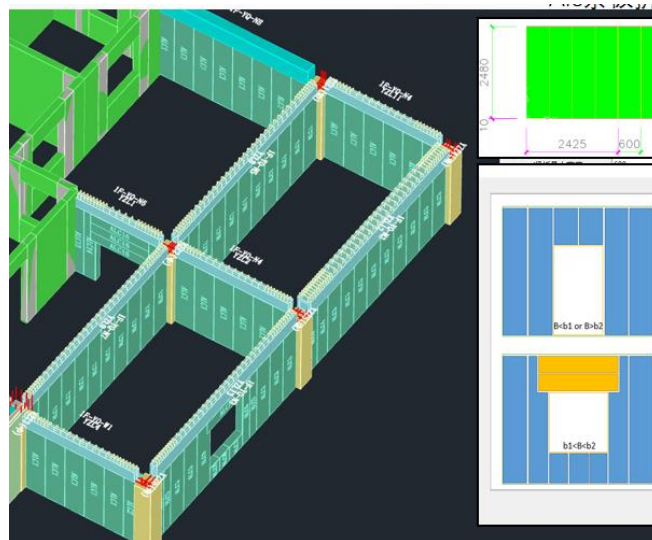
The designation and subdivision functions for prefabricated partition walls (ALC, assembled with slats) in YJK's built-in prefabricated building design software
